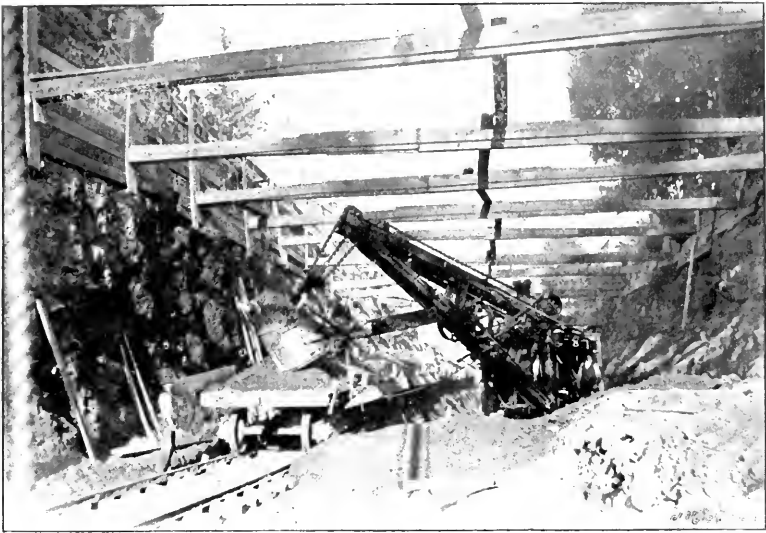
STEAM SHOVEL LOADING FLAT CARS.
